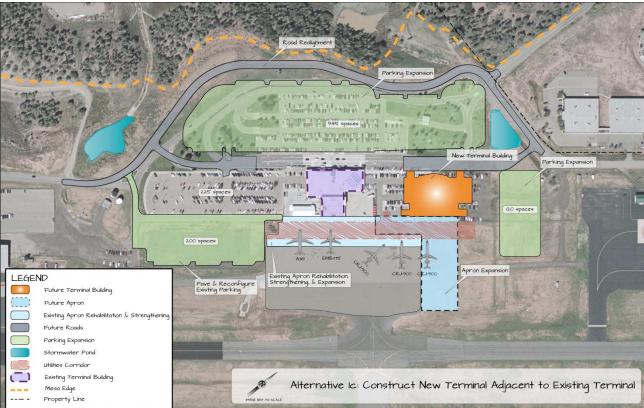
ALTERNATIVE 1C: CONSTRUCT NEW TERMINAL ADJACENT TO EXISTING TERMINAL
